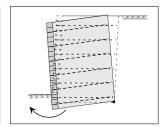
15 Reinforced Wall Bearing Failure
